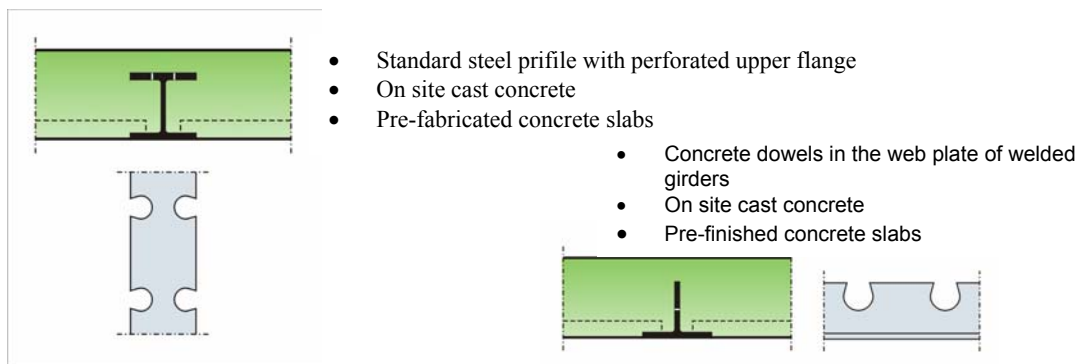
Application of concrete dowels for Slim-Floor-Constructions
